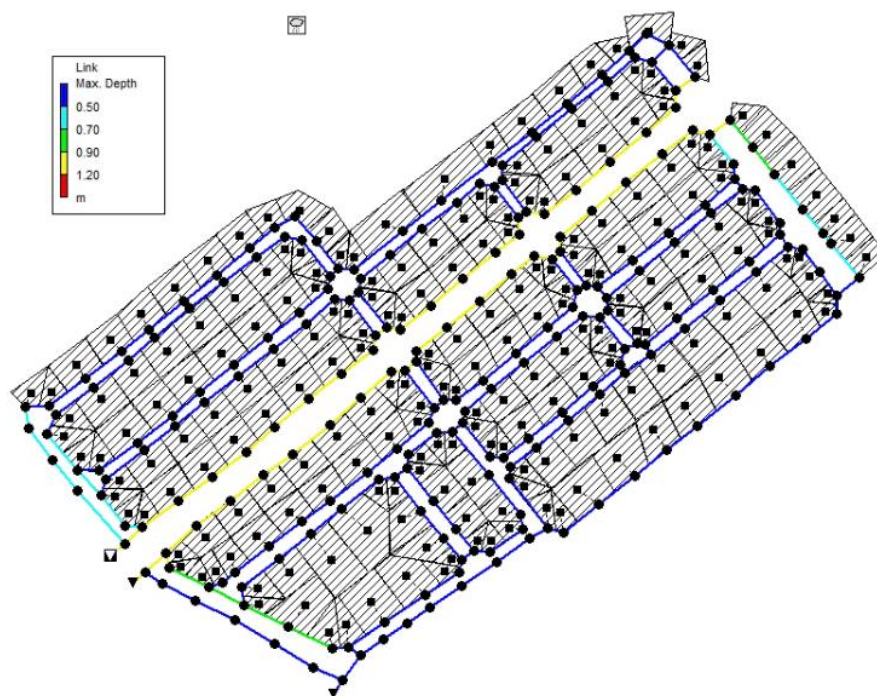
Dimensions of culverts and locations of manholes and discharge gates in the stormwater drainage system. (Note: Triangle symbolizes outfall, Circle symbolizes manhole).
